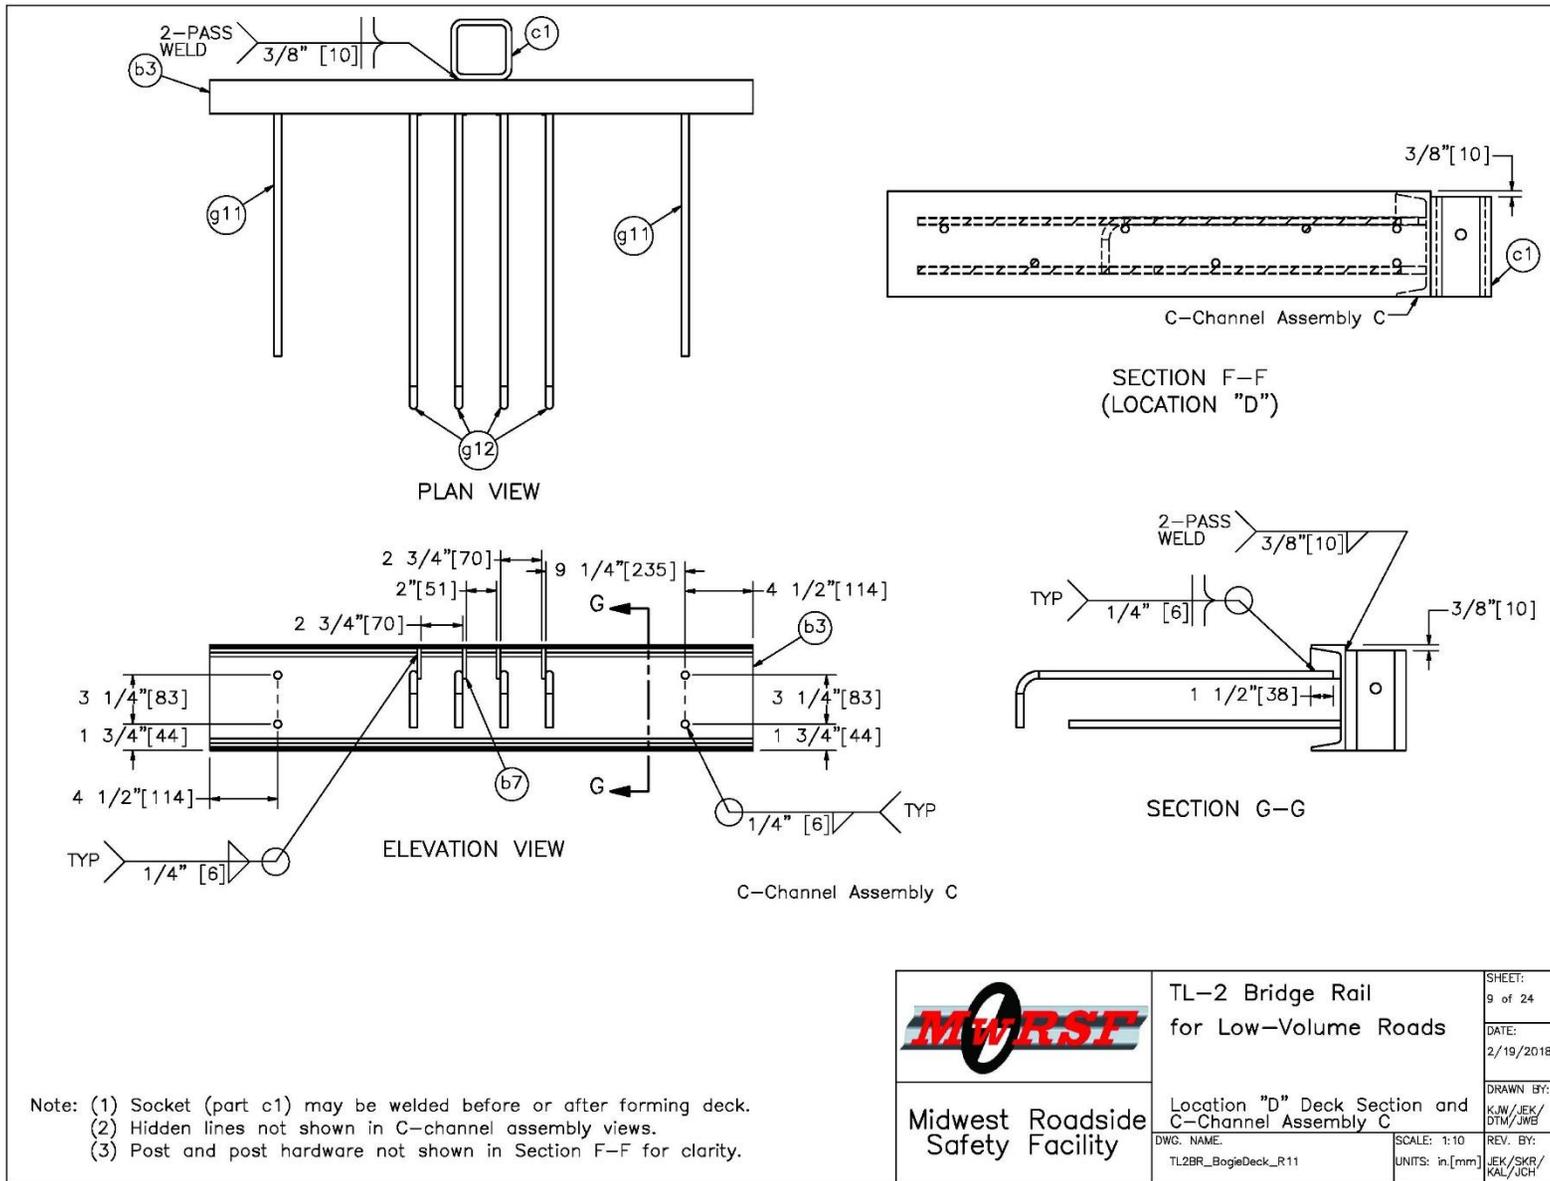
Bogie Testing Matrix and Setup, Location "D" Deck Section and C-Channel Assembly C
